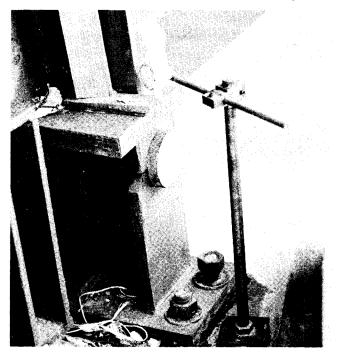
Dial gage installation used to measure bearing deflections during placement of the concrete bridge deck. Plastic covering was used to protect gage from moisture.
